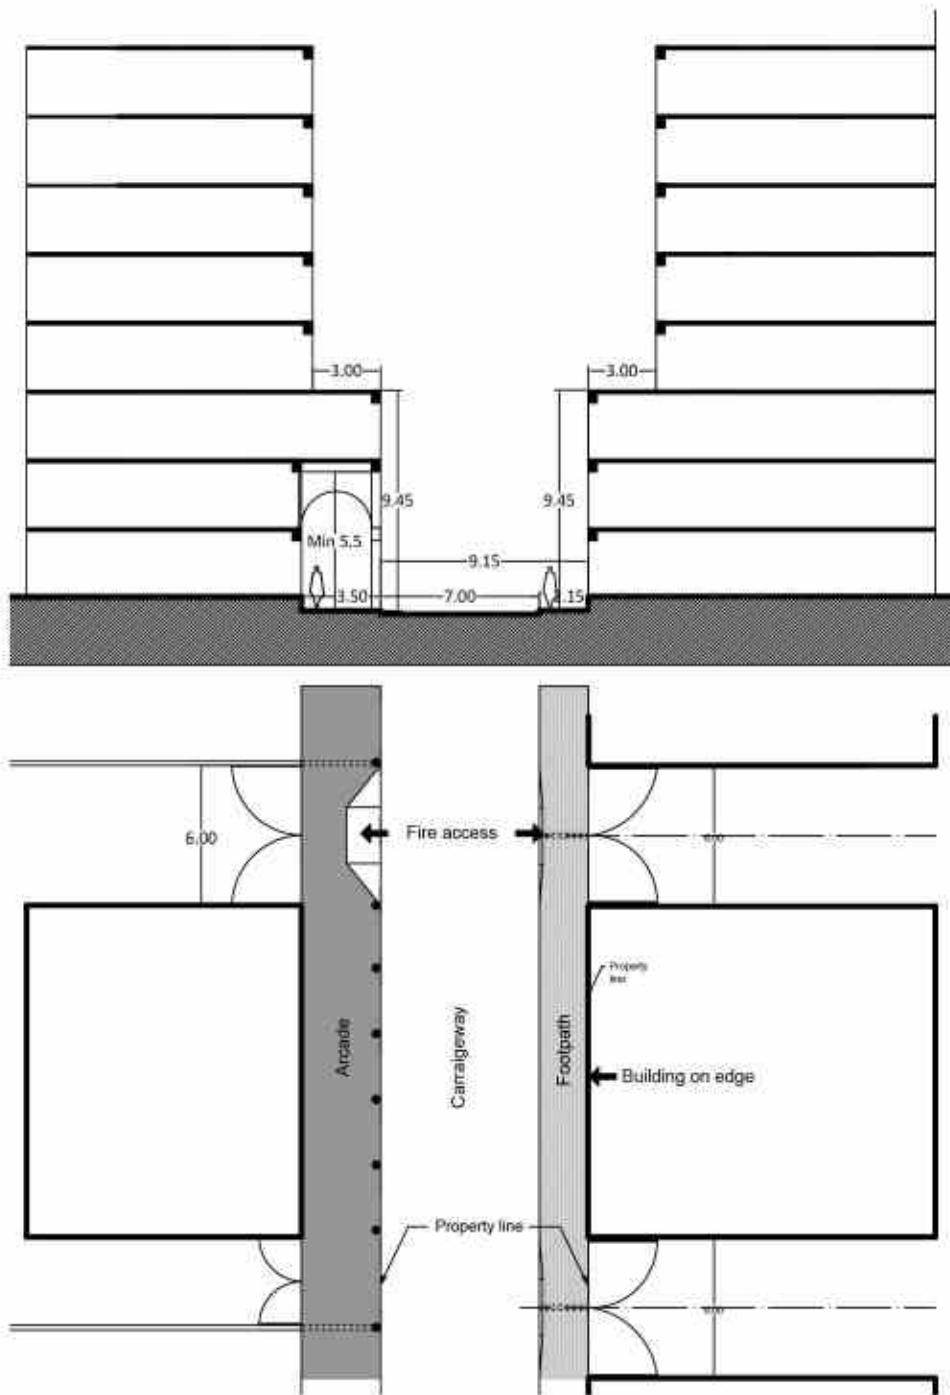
Section and Plan for street with ROW 9.15 M (i)
